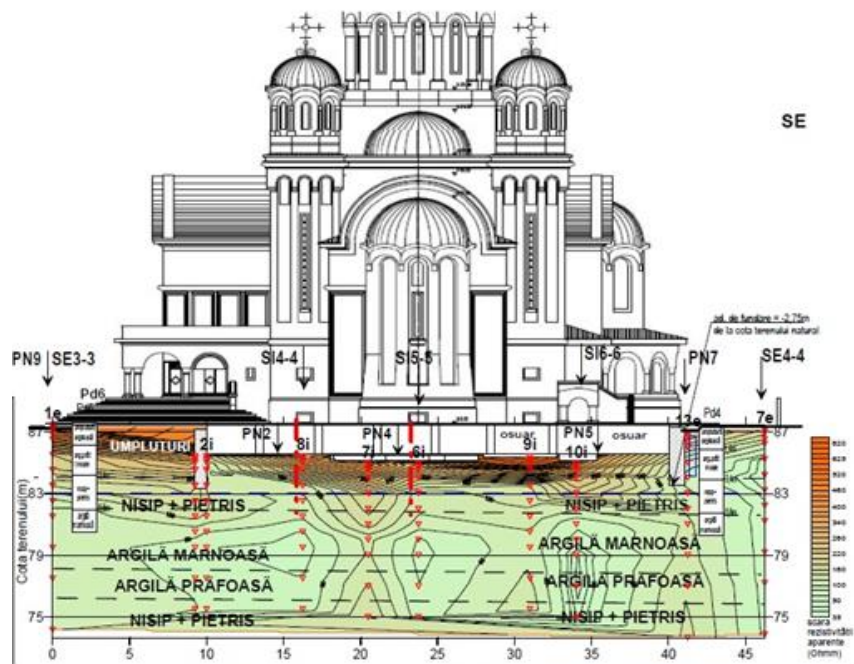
Central, vertical, longitudinal geoelectric section [63]
